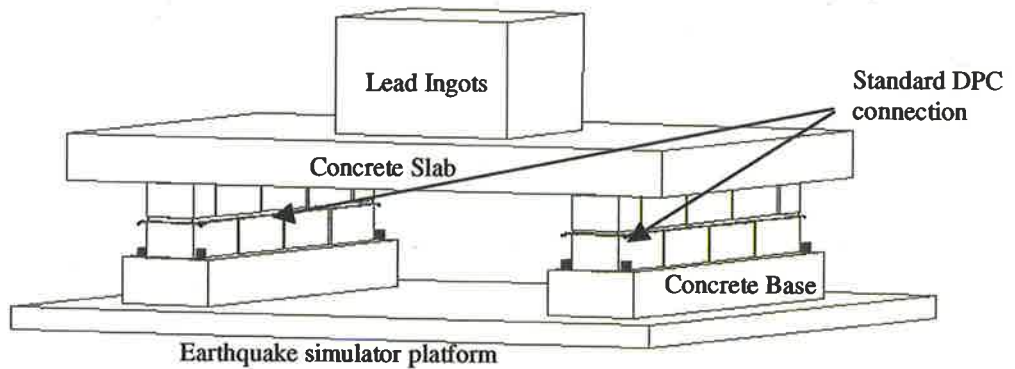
Dynamic Test Set-up for Standard/Centered DPC Connection
